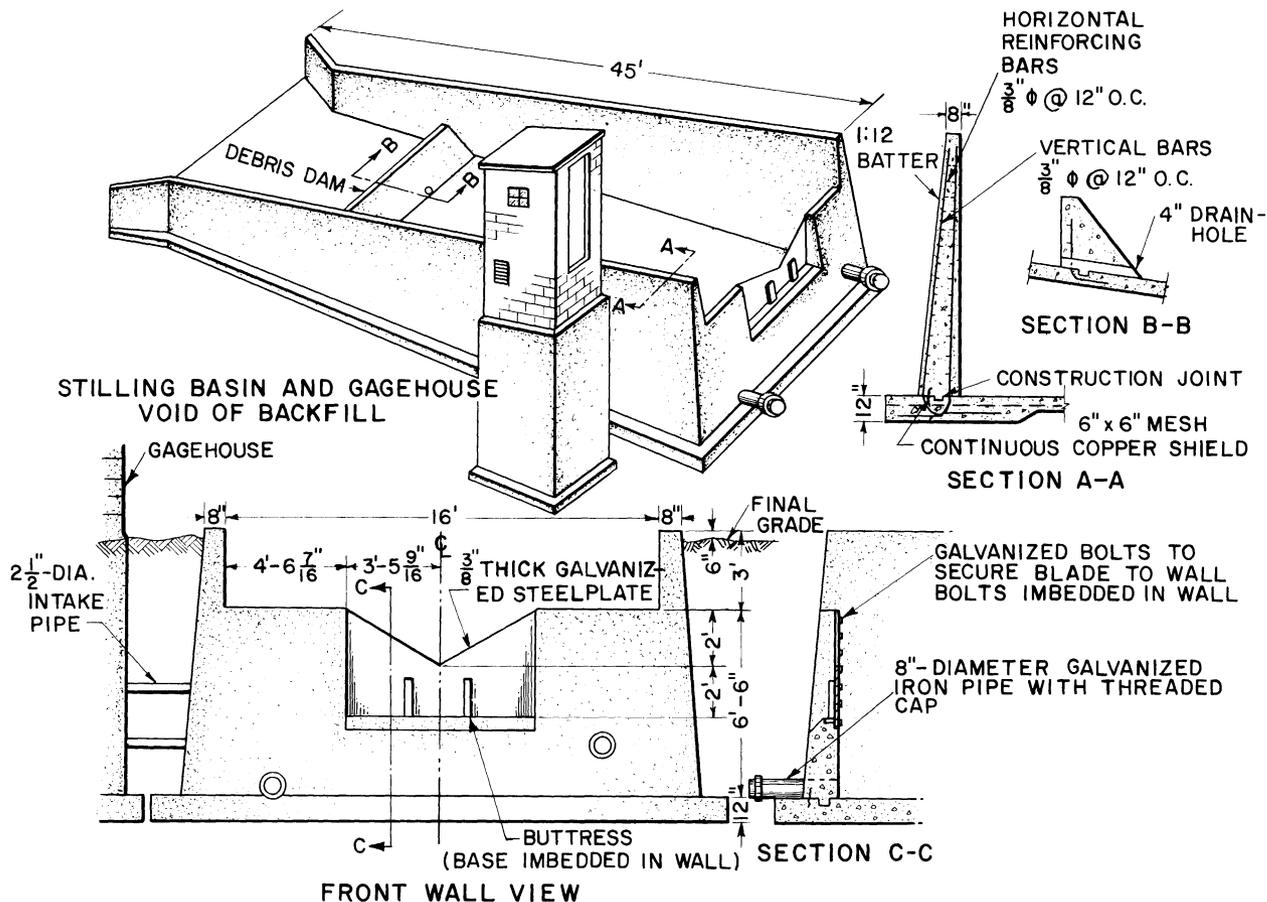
Plans for concrete weir of watertight-box design constructed at Hubbard Brook Experimental Forest, West Thornton, N.H.
